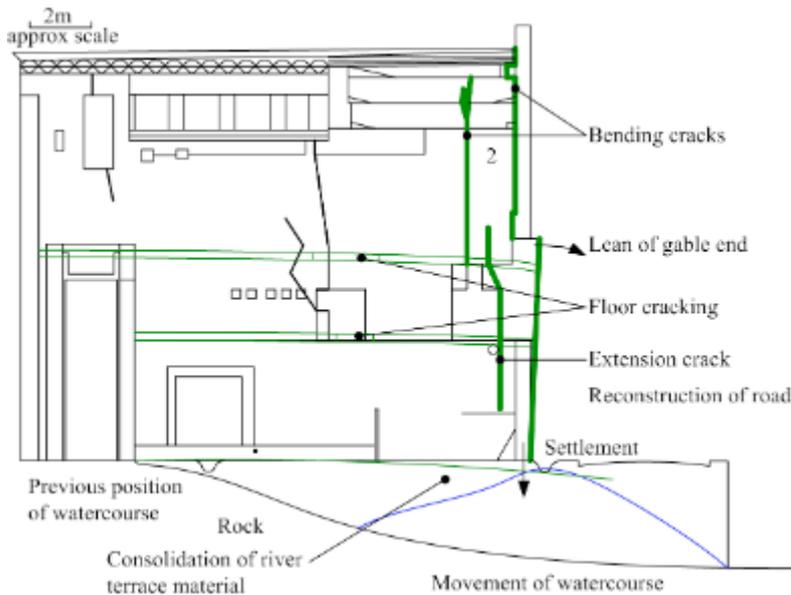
Cracking patterns and causes, east-facing elevation of the north-east tower at Ambel
